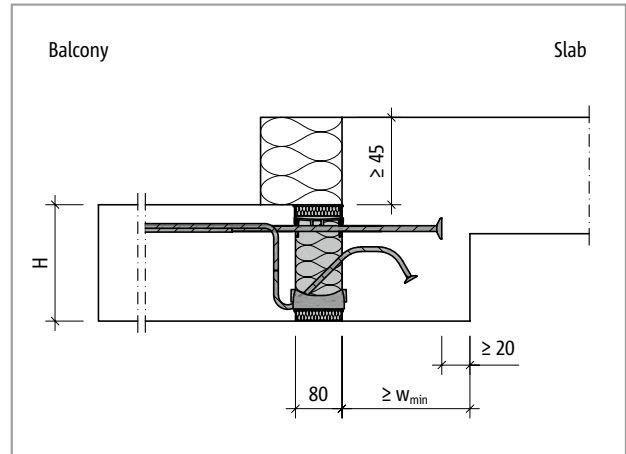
Schöck Isokorb® T type K-U: Balcony with height offset downwards and external insulation
